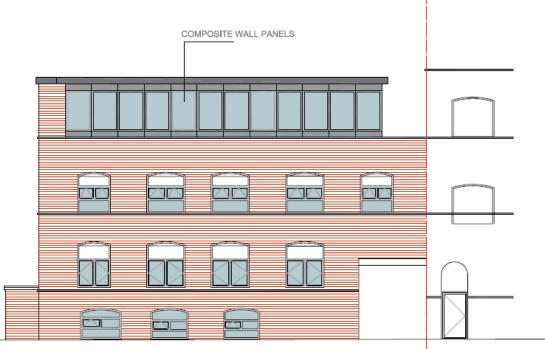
Proposed Elevation as viewed from Rutherford Avenue
